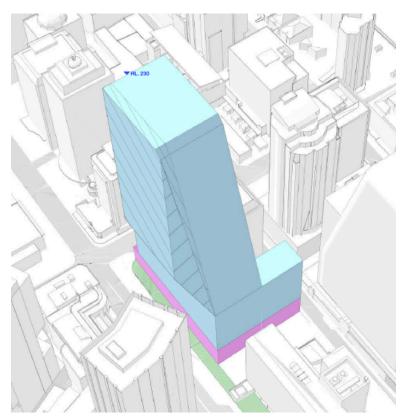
Proposed building envelope: axonometric diagram from southwest Source: Sydney Metro
